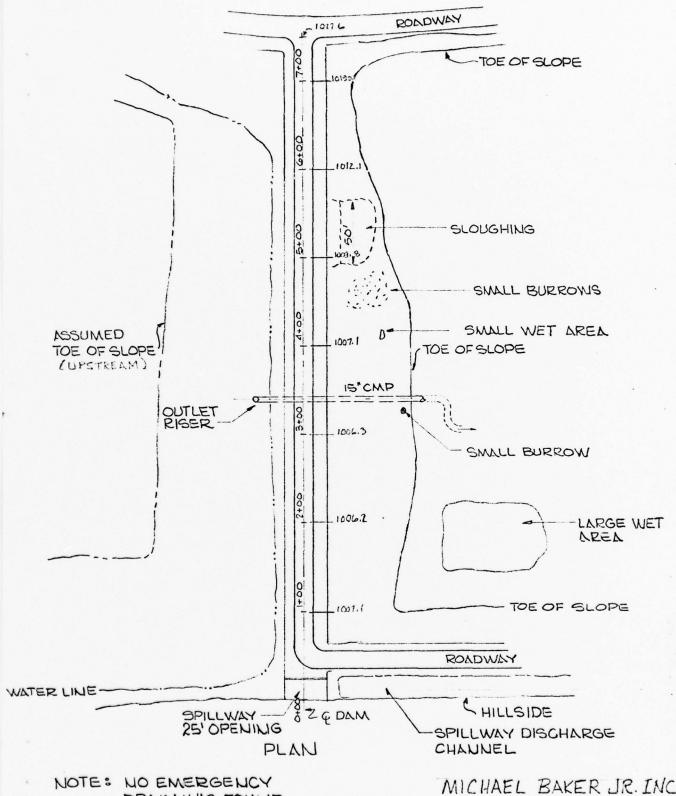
Plan of Dam (Michael Baker, Jr., Inc. Sketch)
